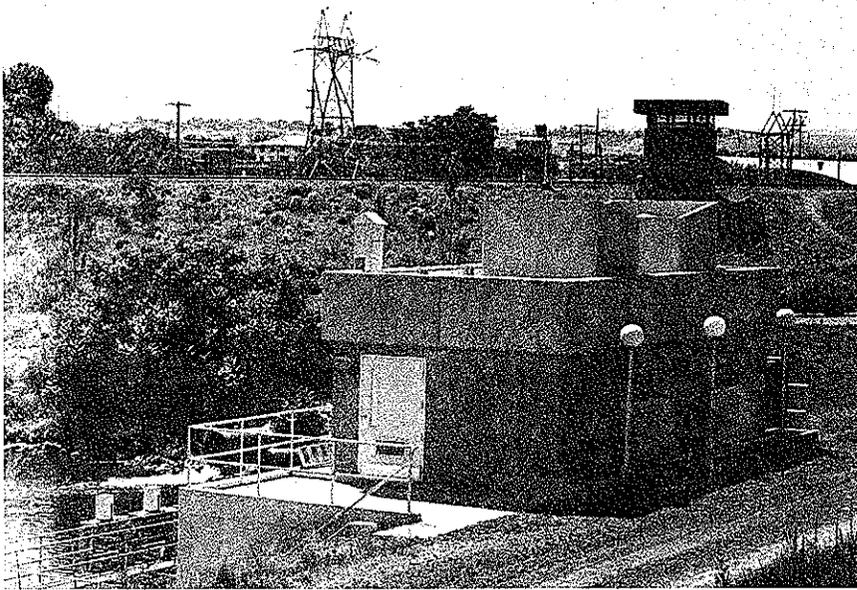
Pumping station on the Lewiston, Idaho, levee providing flushing for interior drainage collection ponds
